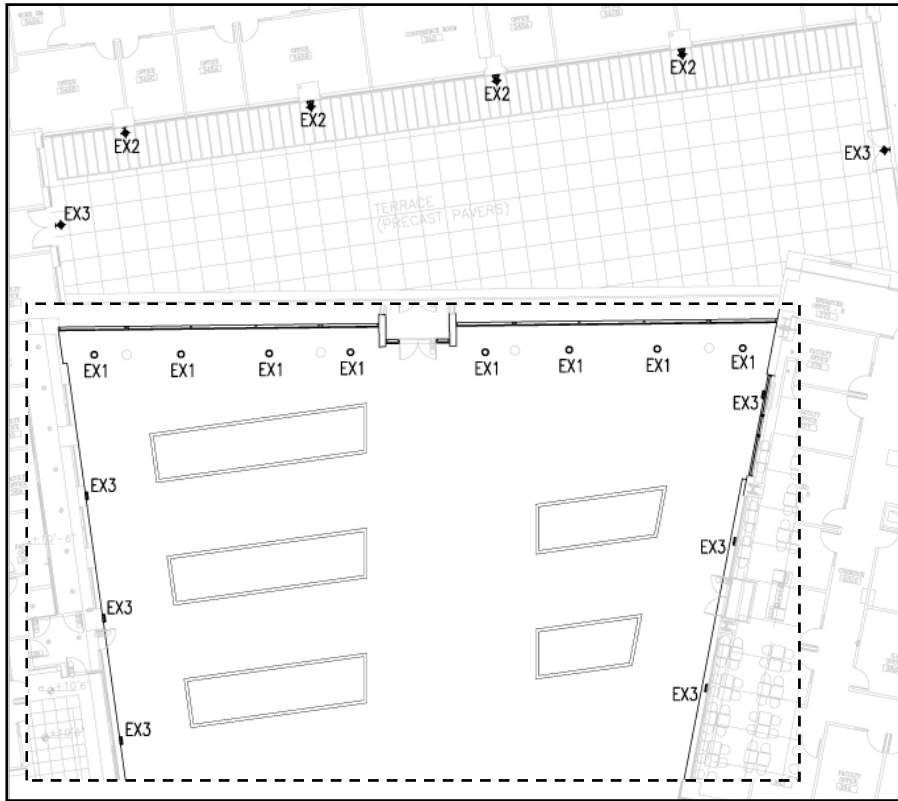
Terrace Lighting Plan, Third Floor (Ground Level Shown in Dashed Box)
